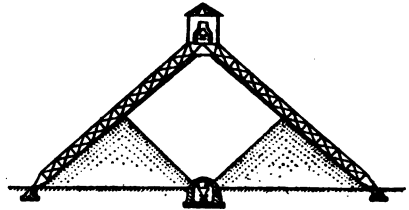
Storage System with Overhead and Tunnel Conveyors.
